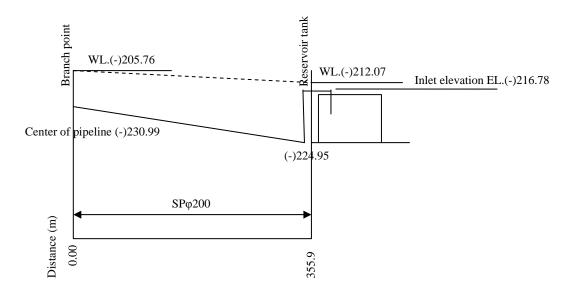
Hydraulic vertical plan of branch point to Jericho reservoir tank
